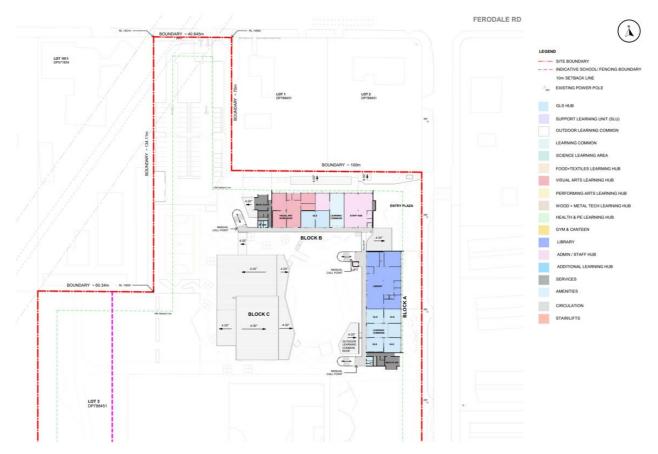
Proposed Level 1 Plan (Source: NBRS)
